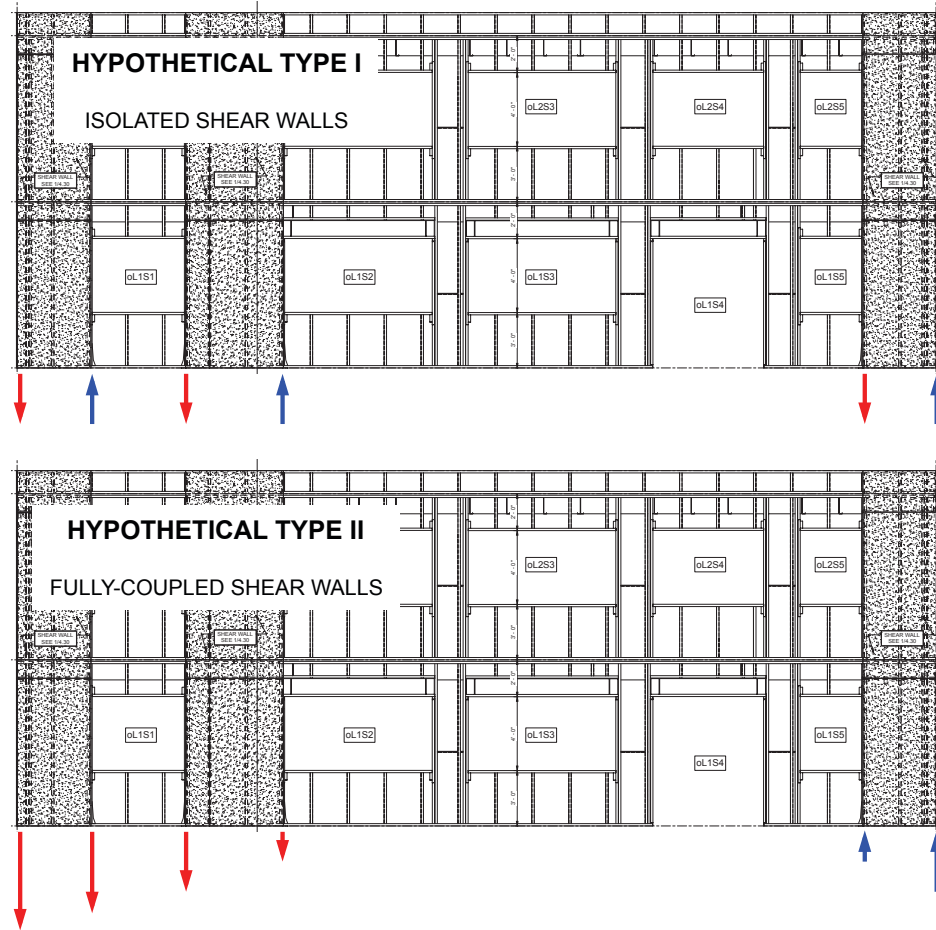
Drawing illustrating the two types of shear wall on the South elevation. The top drawing demonstrates the ideal anchor force distribution for Type I shear walls, or isolated shear walls. The bottom drawing provides an idealization for the hypothetical Type II, or fully-coupled shear walls (Peterman 2014)
